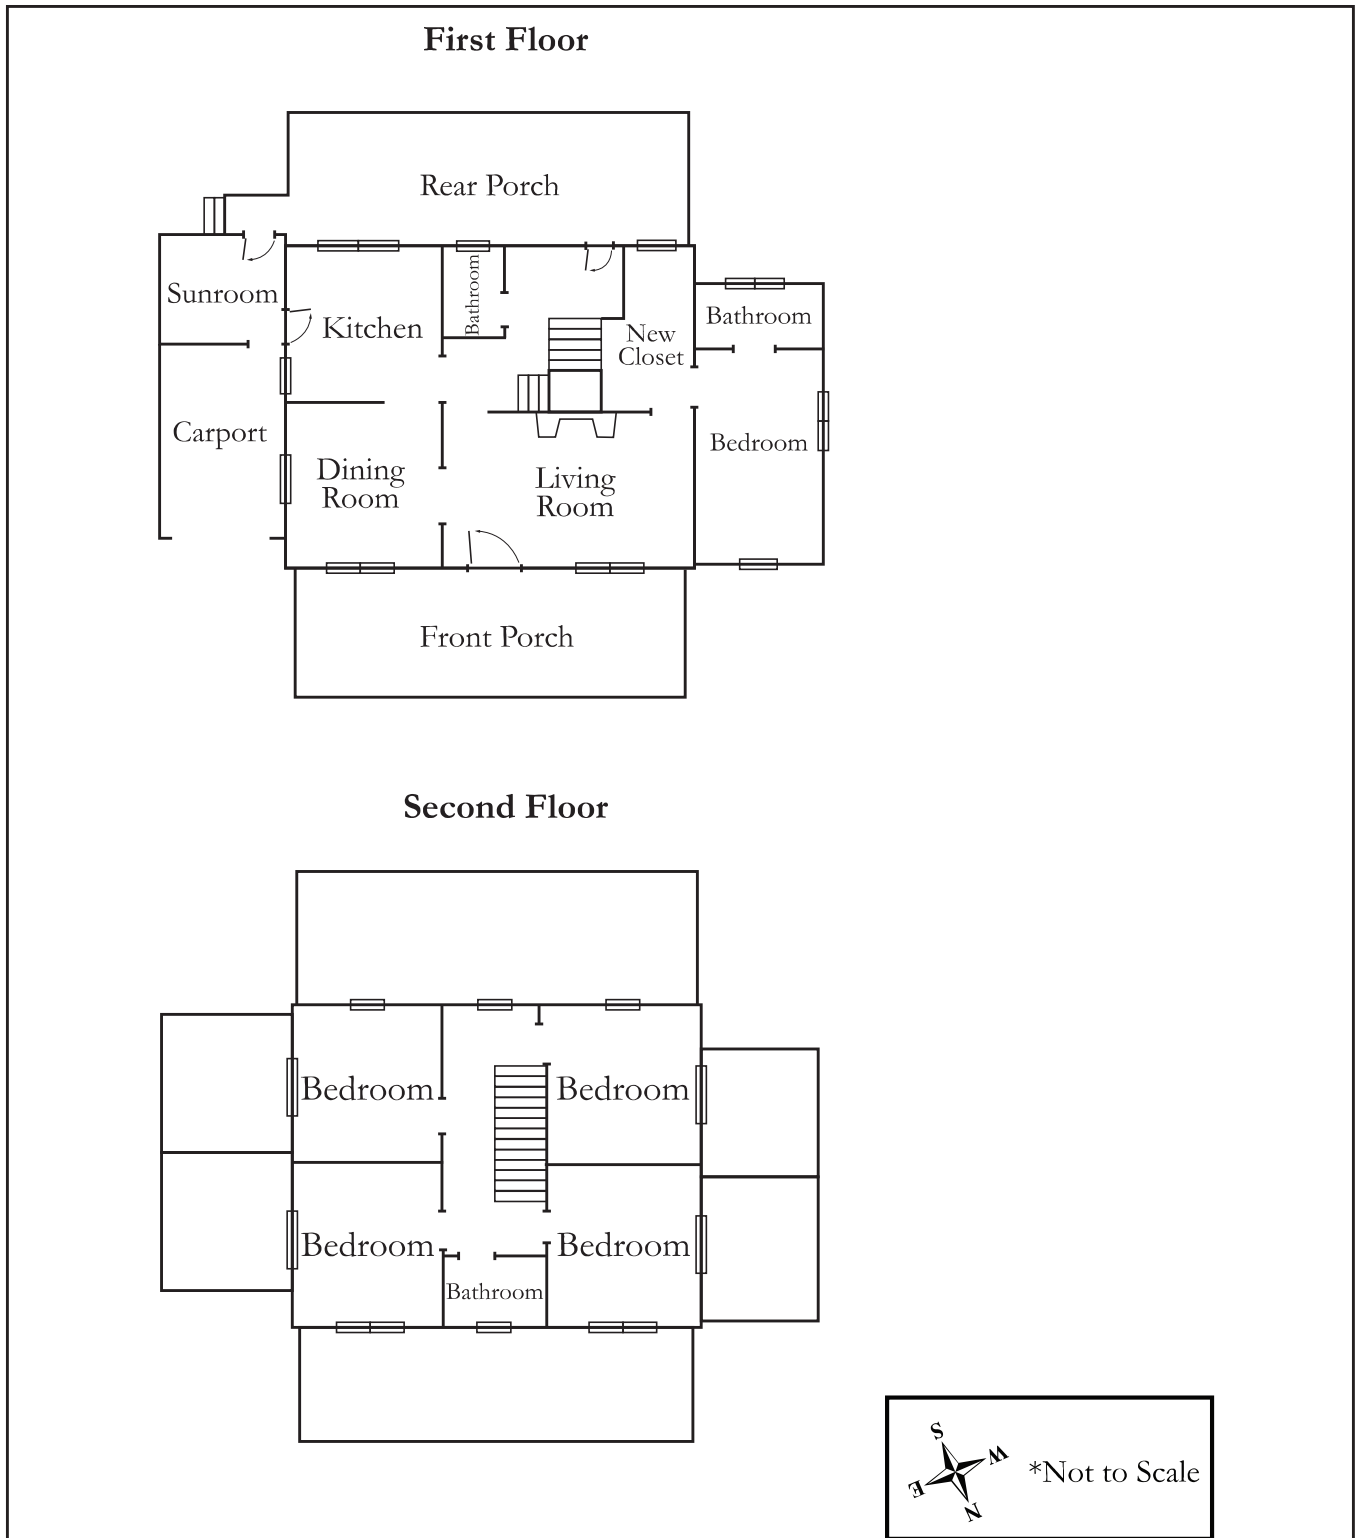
Floorplan (Richard Grubb & Associates, Inc. 2024).
